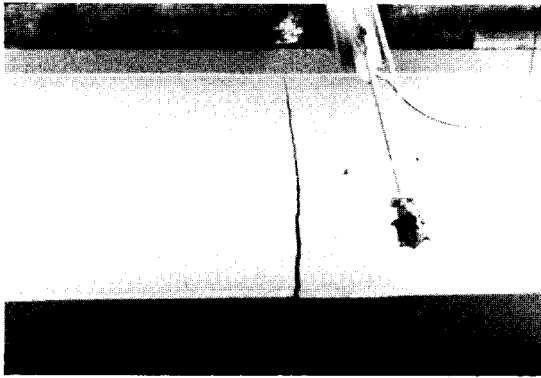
The fractured girder caused by propagation of the fatigue crack that was created from weld flaw
